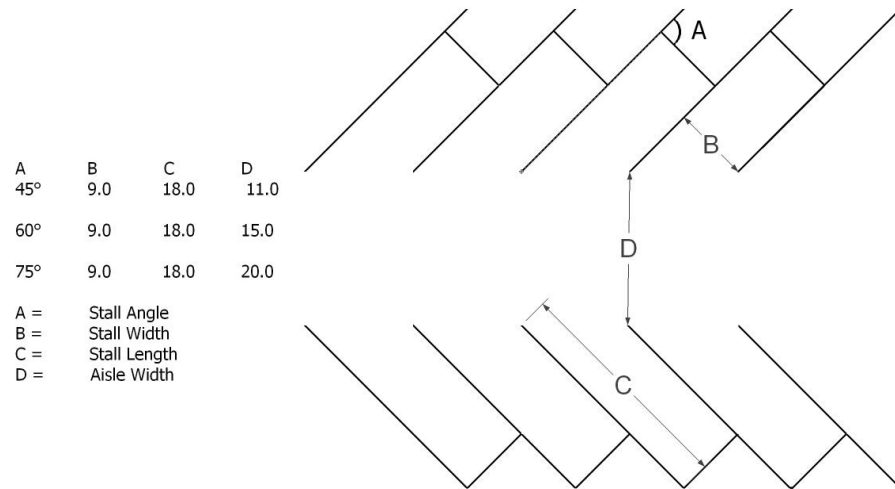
Parking layout dimensions for 9.0' stall widths at various angles with one-way aisles (minimum standards)
